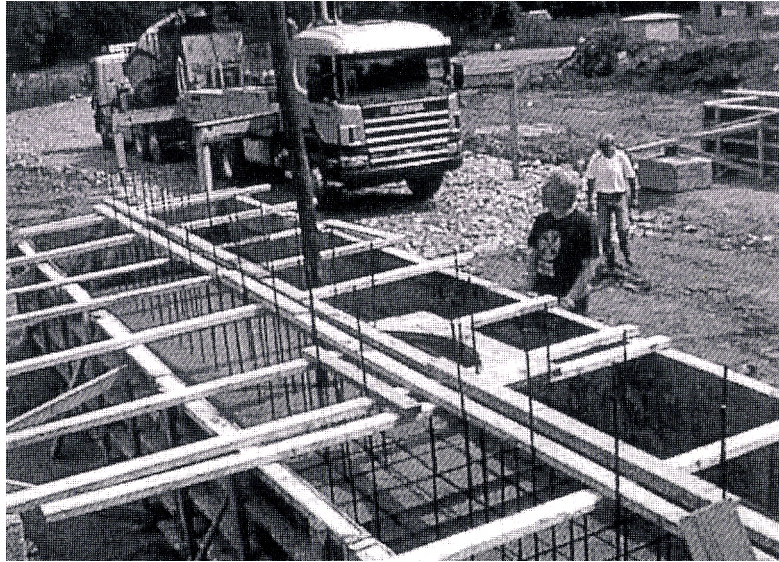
Single pump operator casting a bridge pier foundation (Skarendahl 2000b)
